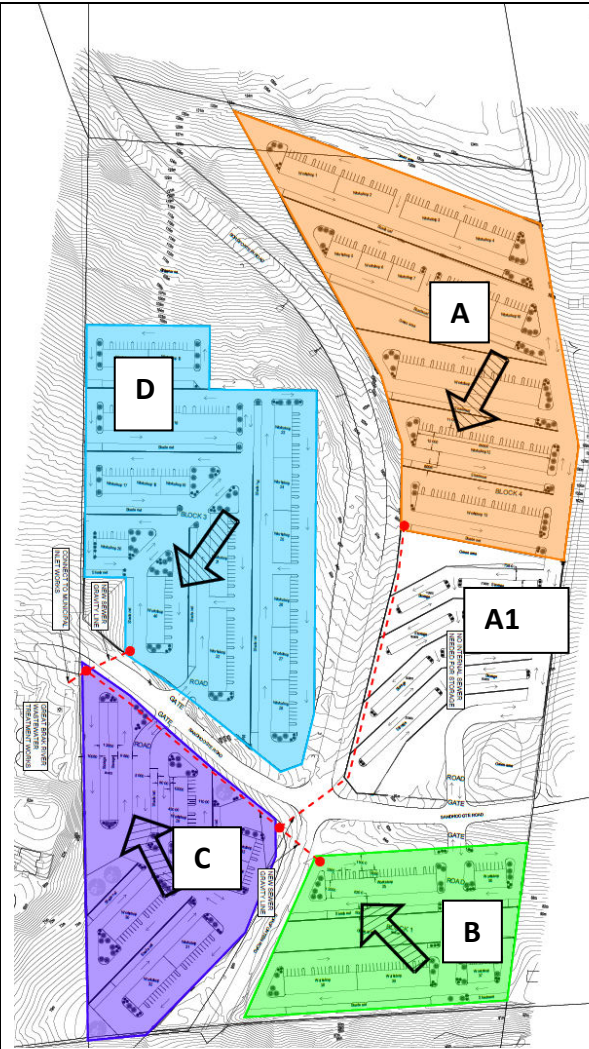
Sewage drainage zones (full plans provided in Appendix B)
